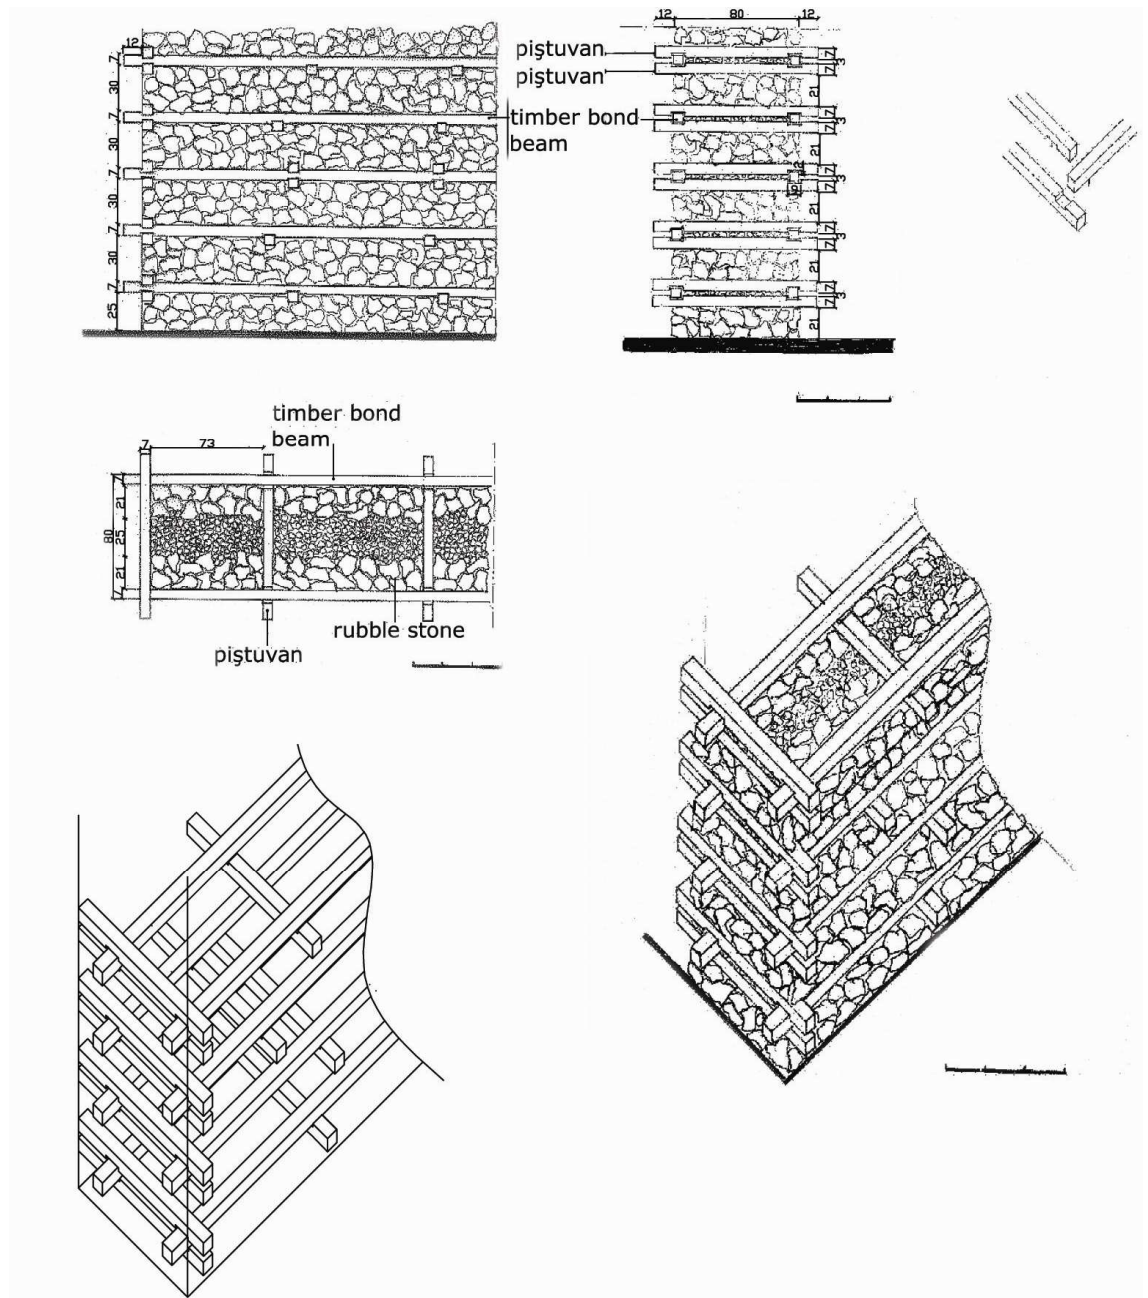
15 Drawing of the wall connection.... Çelik 2008.
